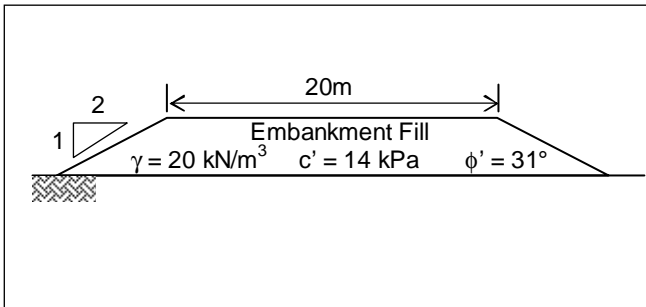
Typical Cross Section of Muar Test Embankment, Johor, Malaysia
